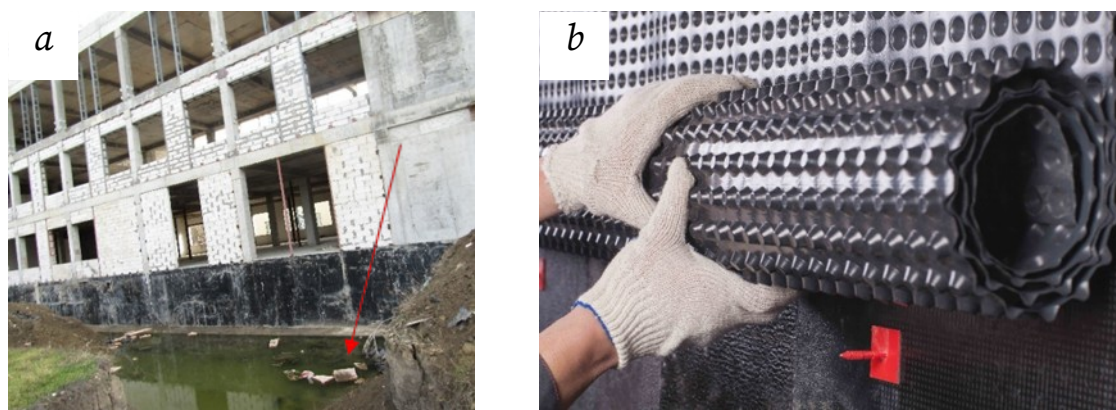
a* - building rubbish in the backfill soil at various construction sites; *b* - waterproofing protection with profiled membrane
